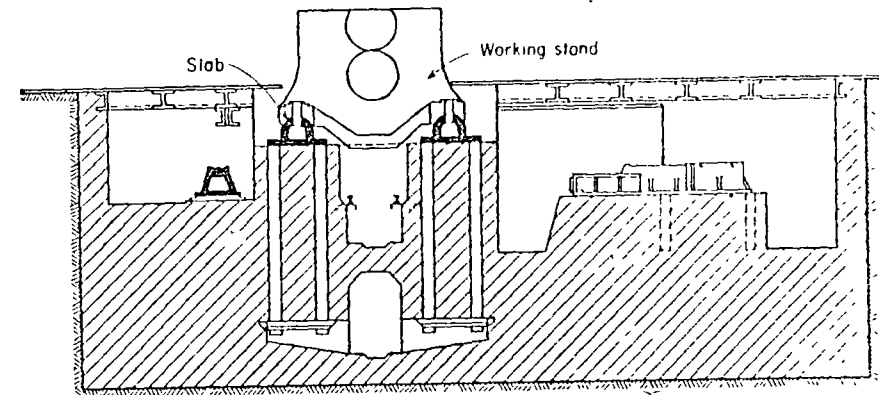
Foundation for a stand of a sheet-rolling mill
